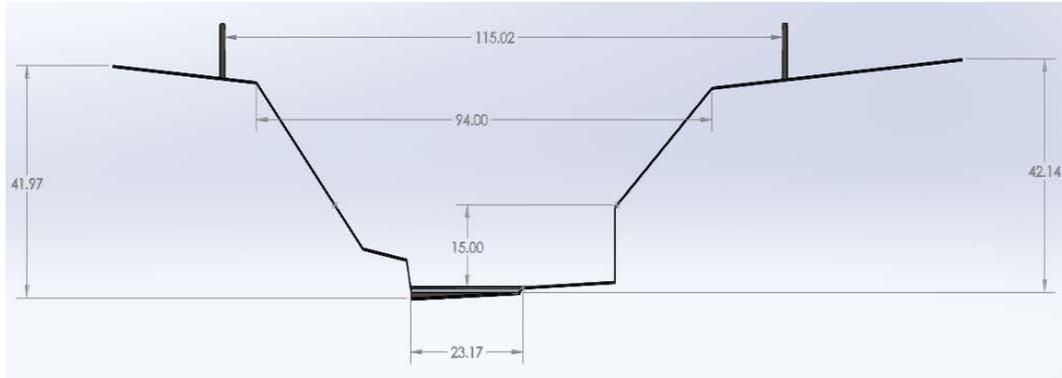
DHH Site Cross Section (Dimensions in ft.)
